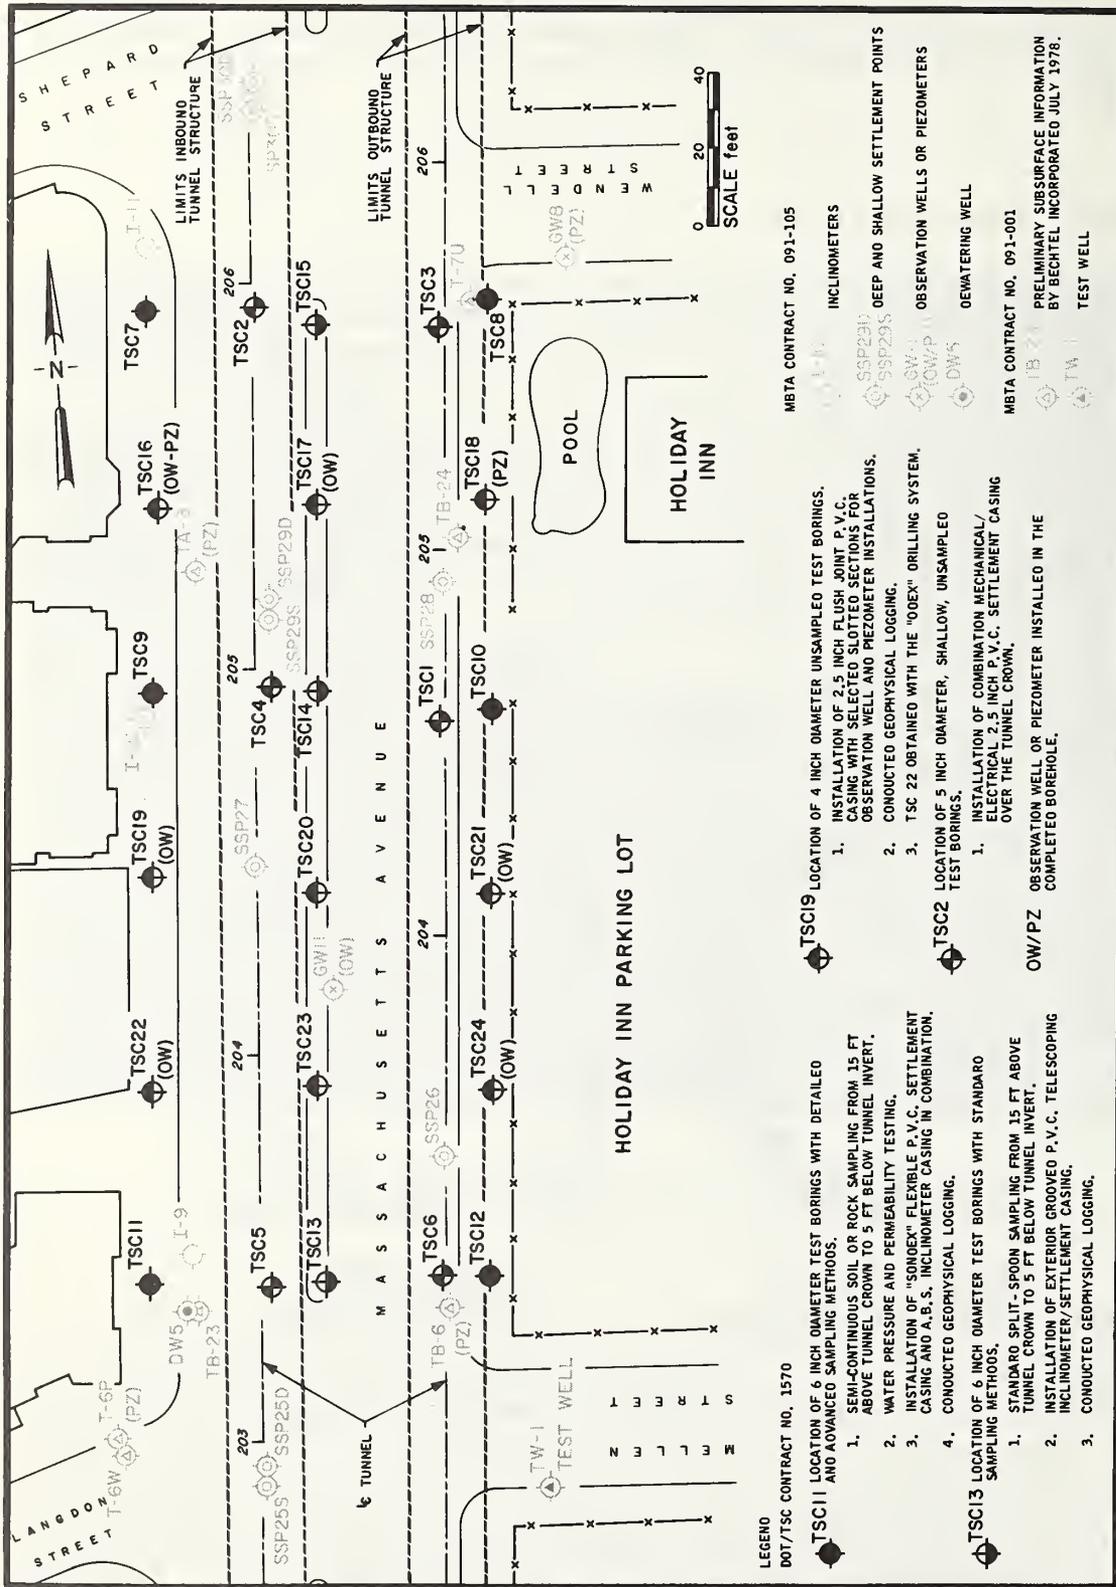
SUBSURFACE EXPLORATION LOCATION PLAN, TEST SECTION, CAMBRIDGE, MASSACHUSETTS
